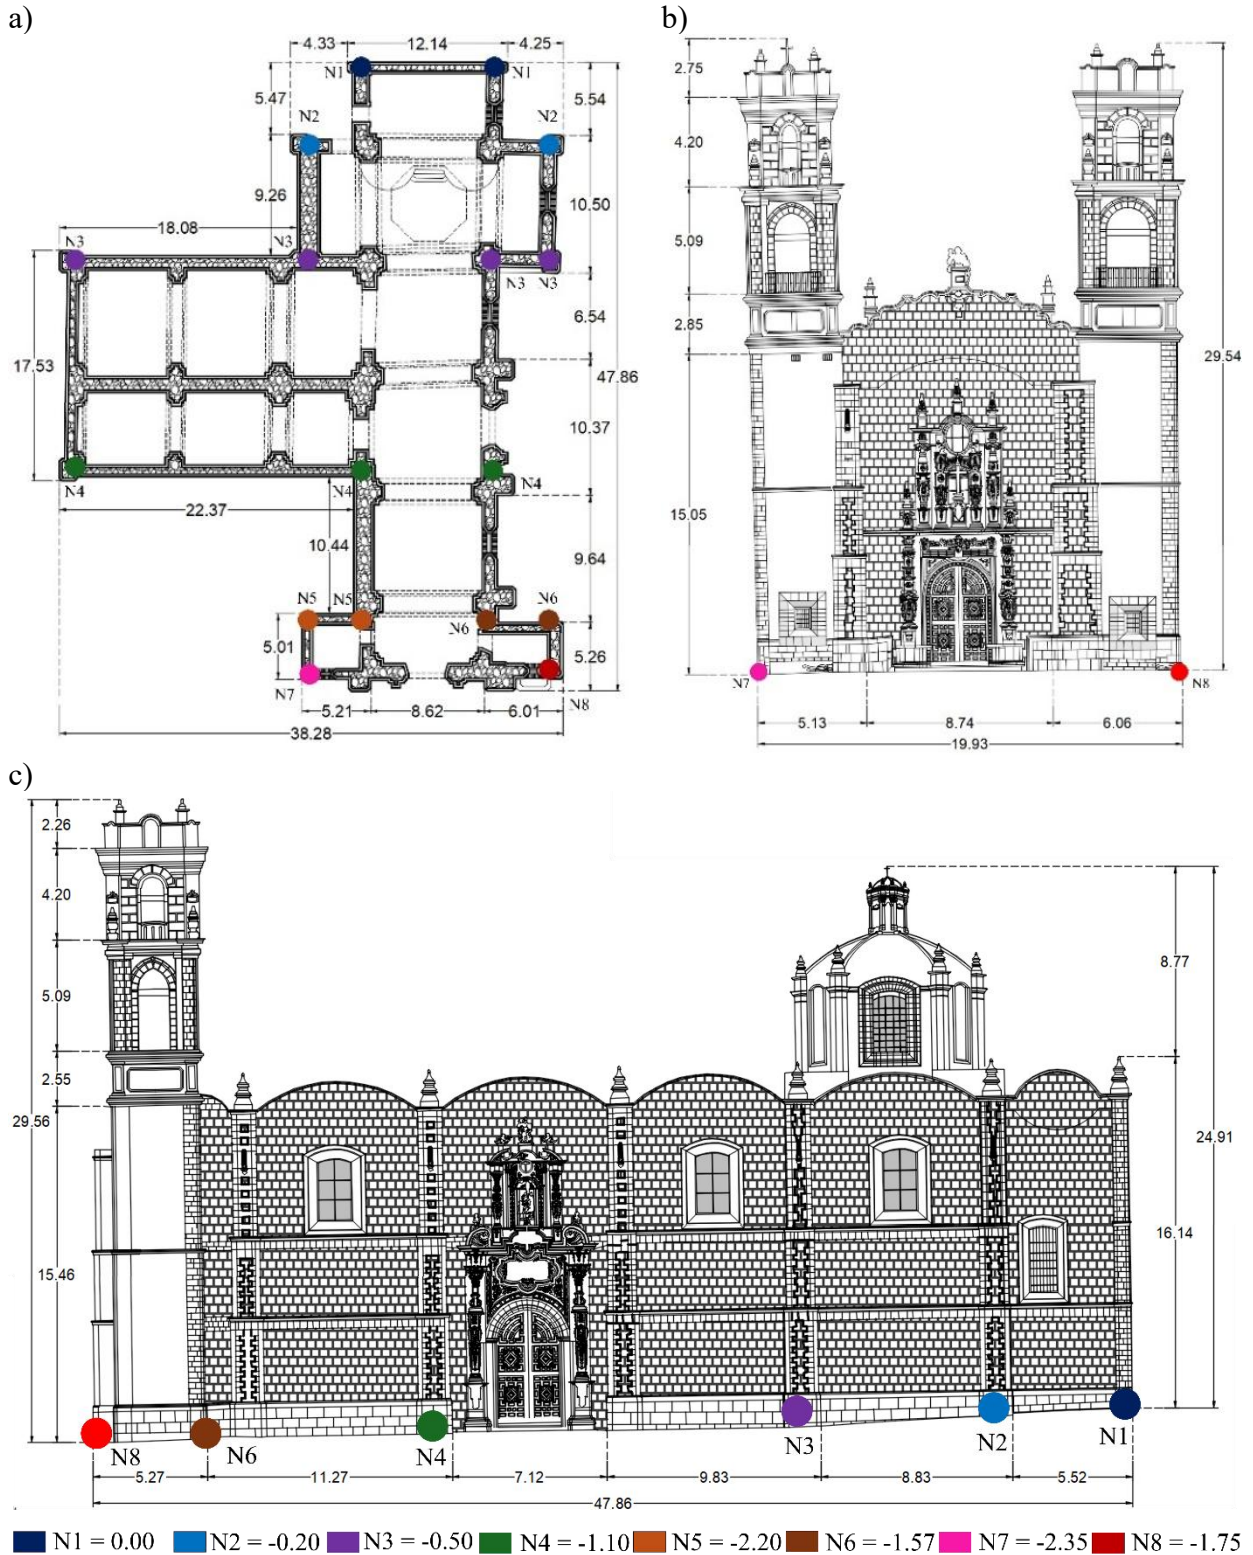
Temple of Santa Veracruz. a) general architectural plan, b) main facade, c) longitudinal side elevation. Taken and adapted from Zepeda A., et. al. (2014).
